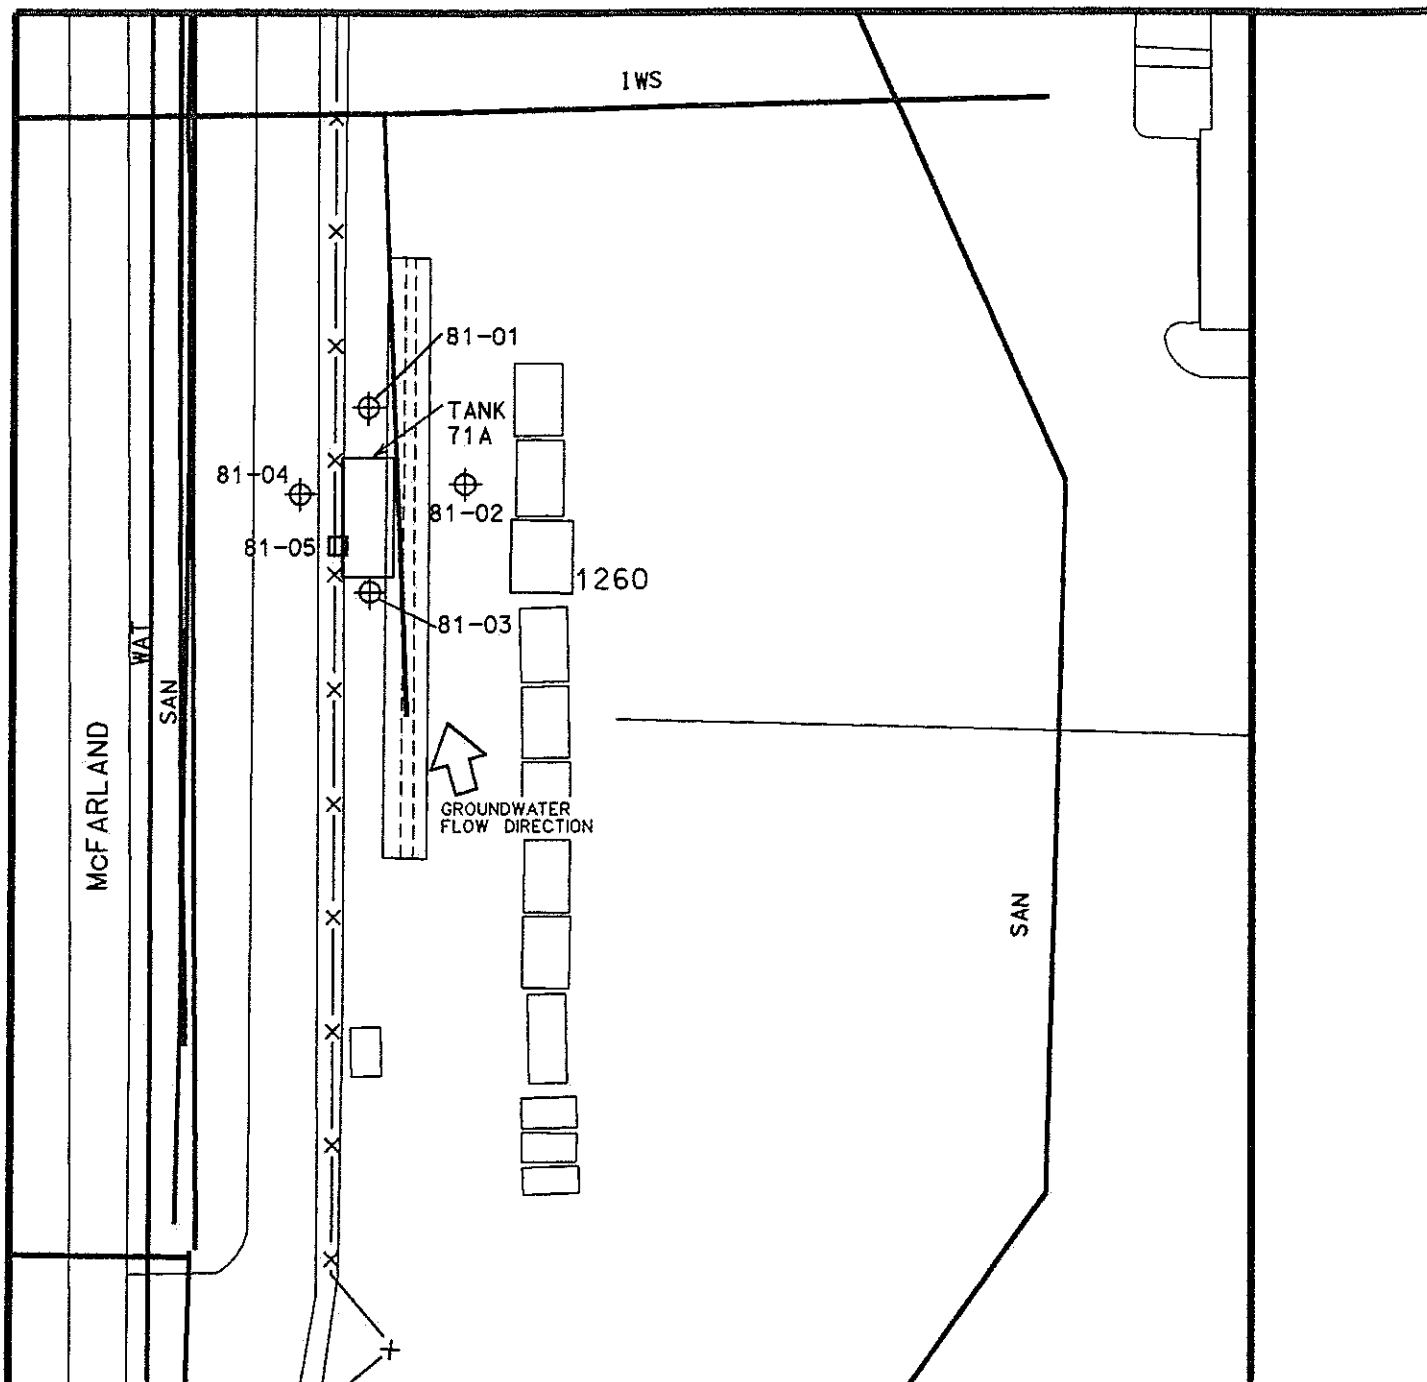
Site Plan for the UST 71A, Building 1260 Site Investigation
